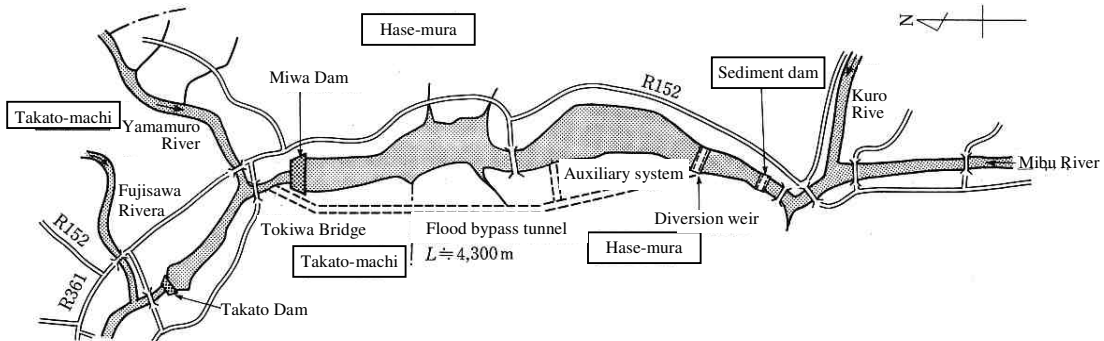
Arrangement Plan for Installations of the Miwa Dam Redevelopment Project
